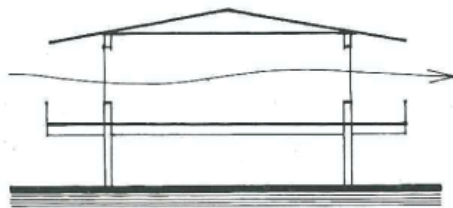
Single-banked rooms should be used when low heat capacity and cross ventilation are required.
